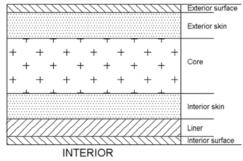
Typical Glass Reinforced Polymer Mortar Pipe Wall Section
